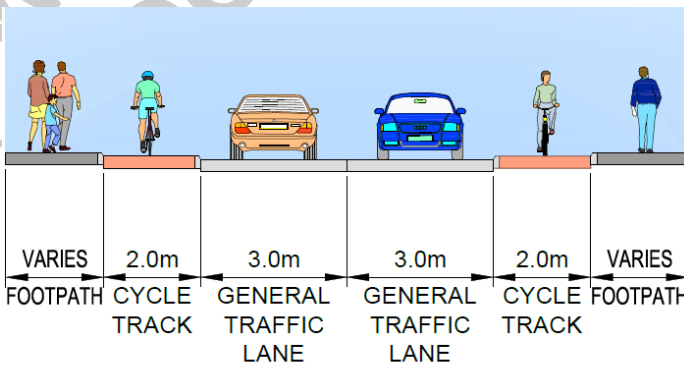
Section 1A, Proposed Option 1 – Cross Section A-A
